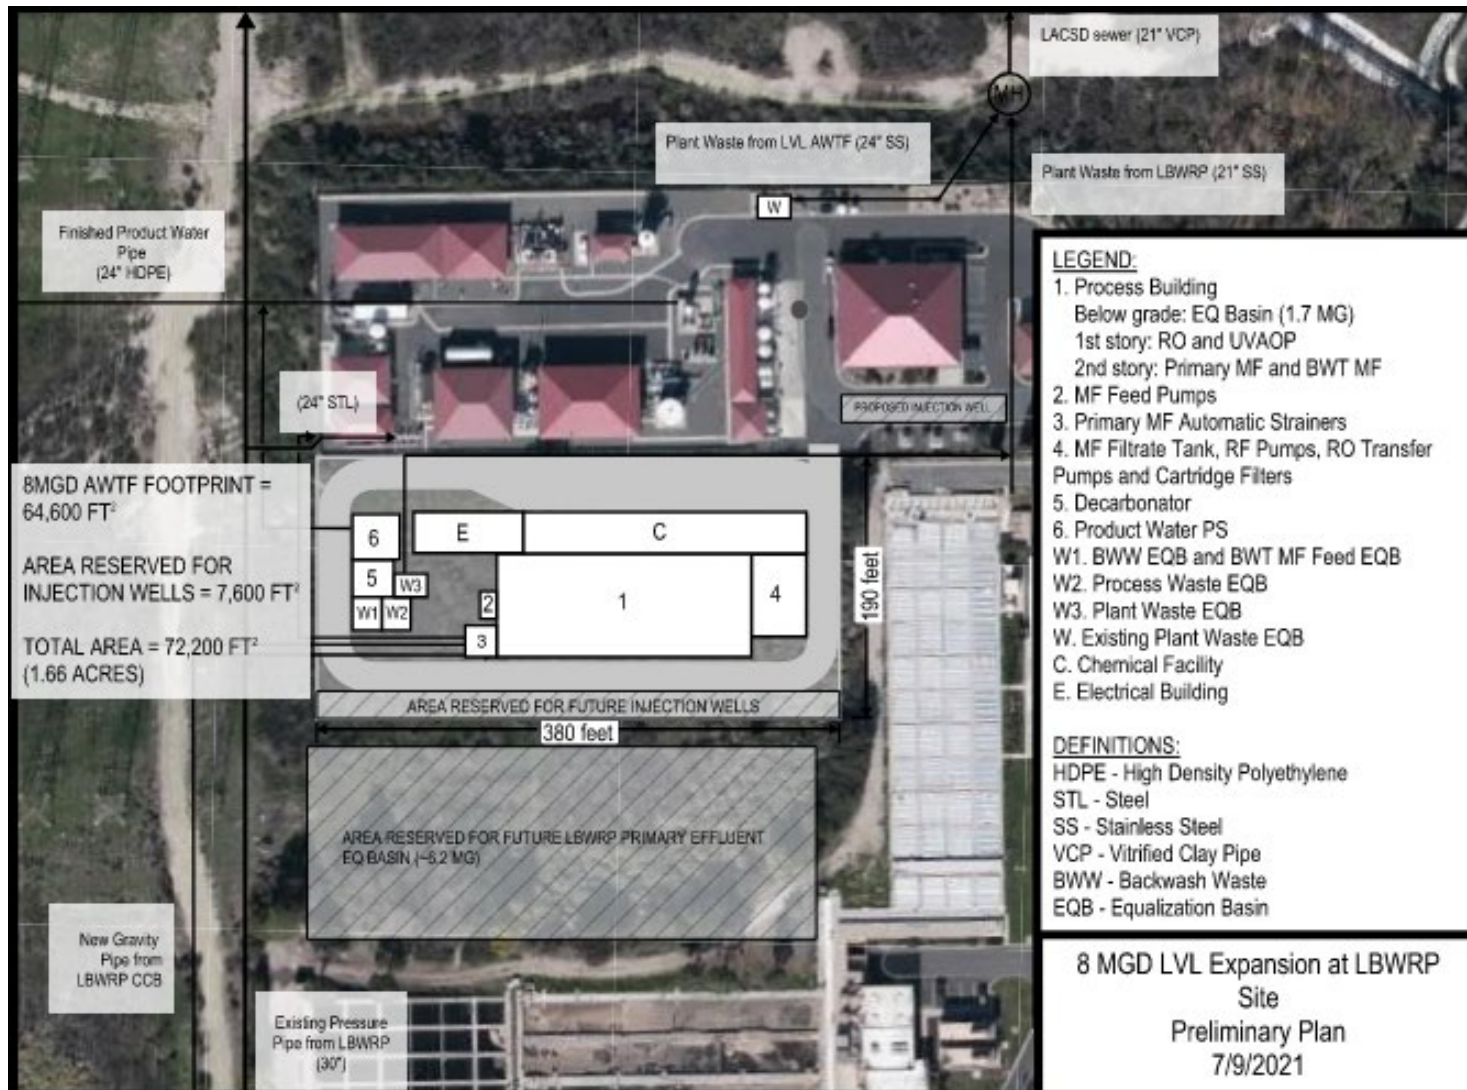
Expansion Advanced Water Treatment Plant Layout at the Long Beach Water Reclamation Plant Site
